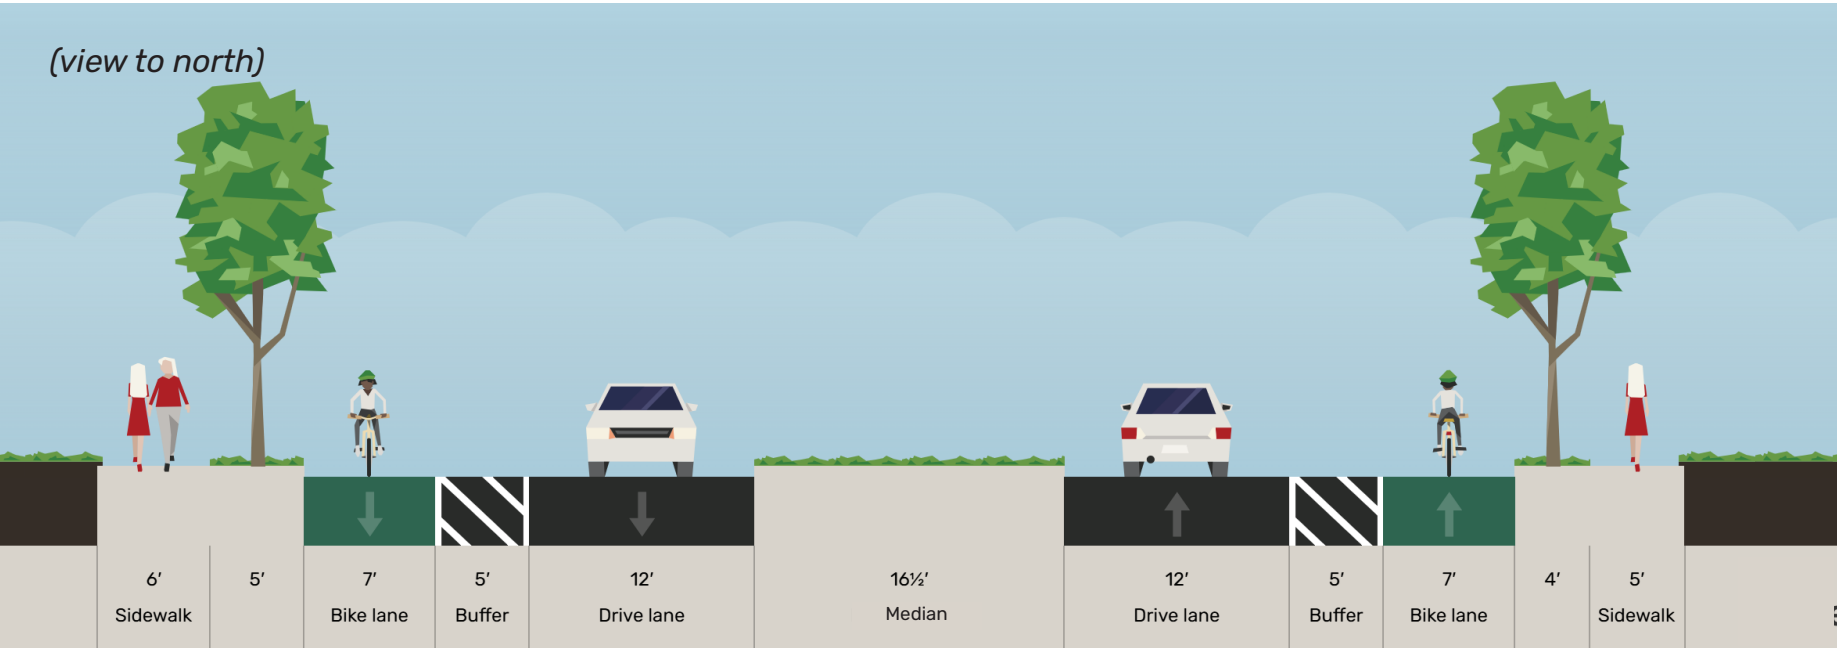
Proposed Typical Cross-Section on Corinth Parkway, west of IH 35 (84' ROW)
